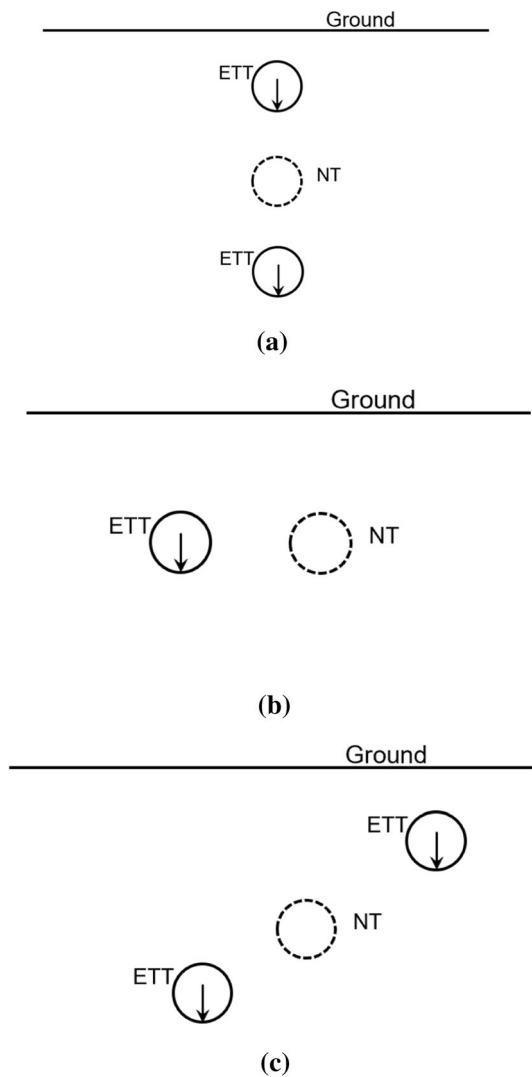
The relation between the existing traffic tunnel (ETT) and possible location of a new tunnel (NT), a NT directly above or below ETT, b NT next to ETT and c NT on the top (or bottom) right (or left) of ETT
